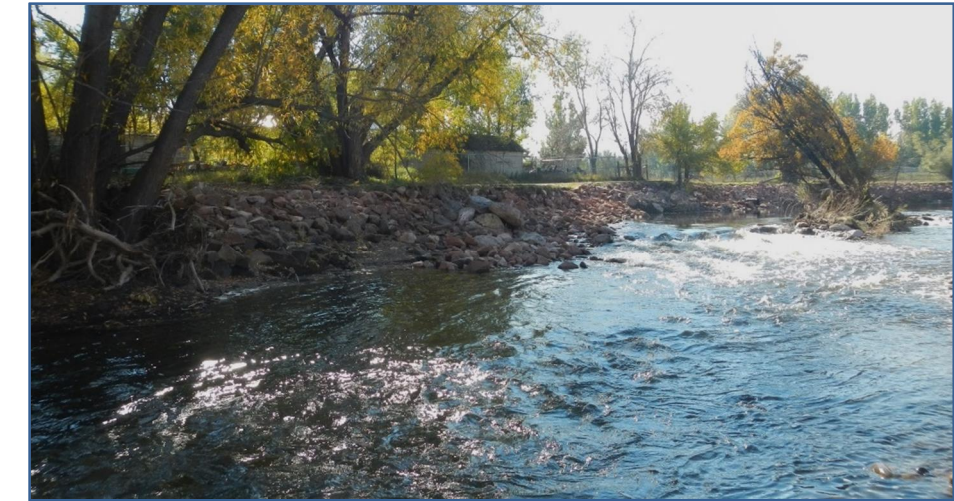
Exposed Riprap Bank Armoring near Wood Street
